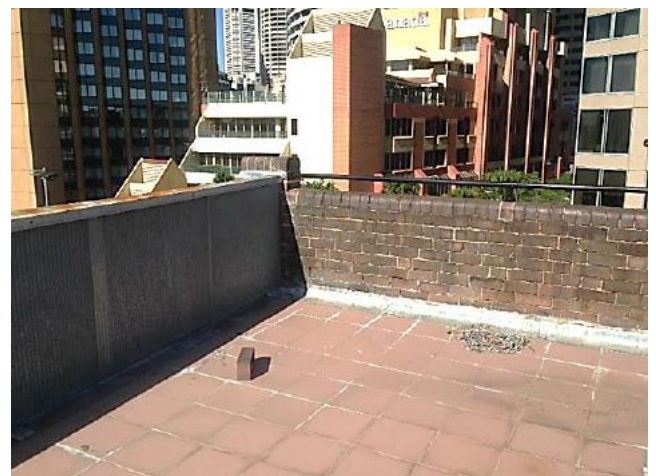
Exterior of Laundry (A1) and open rooftop terrace, chimney stack and chimney pots, tiled roof, 117A Gloucester Street, 2016. Source: Sydney Harbour Foreshore Authority, M Stacy
